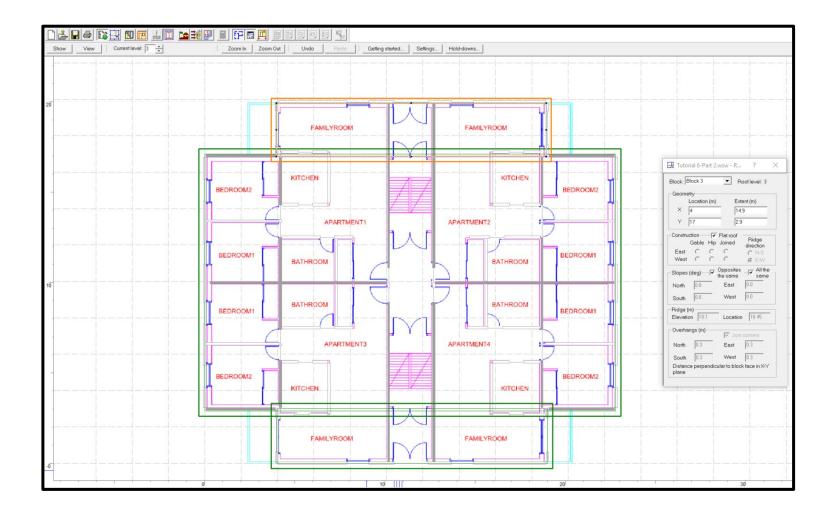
Shearwalls Tutorial 6 – Third Roof Block
